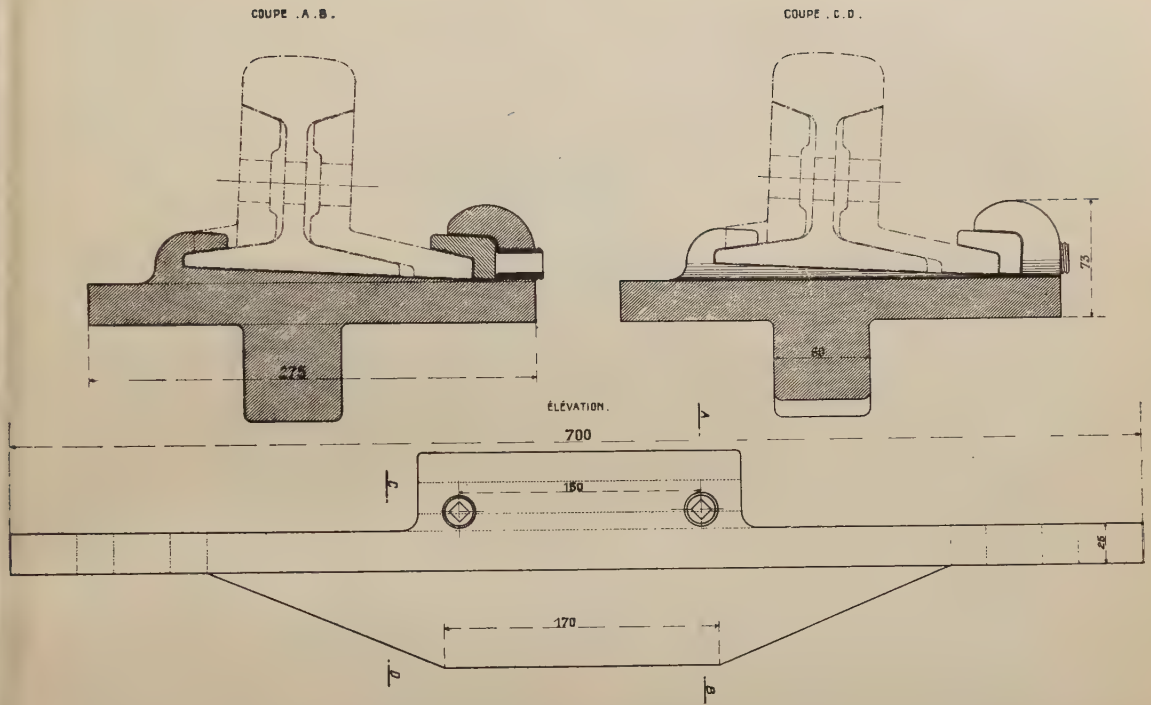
Swedish State Railways. — Bridge joint with jaw gripping the foot of the rails.
